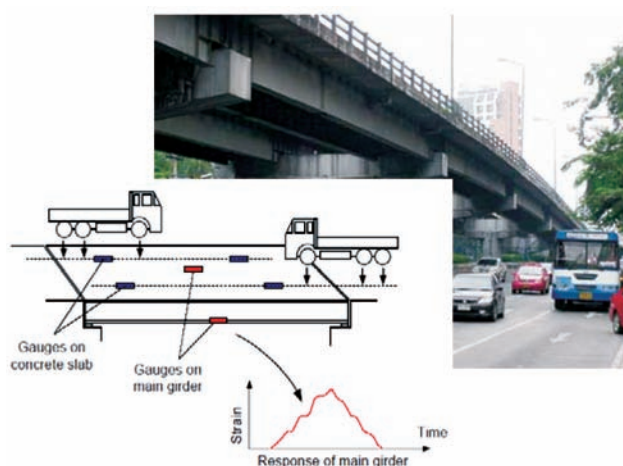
Layout of BWIM system and the monitored bridge in Bangkok
